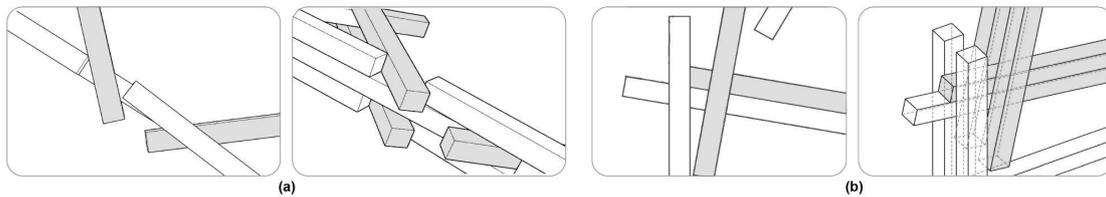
Joint system exploration: (a)open joints; (b)face-to-face joints
